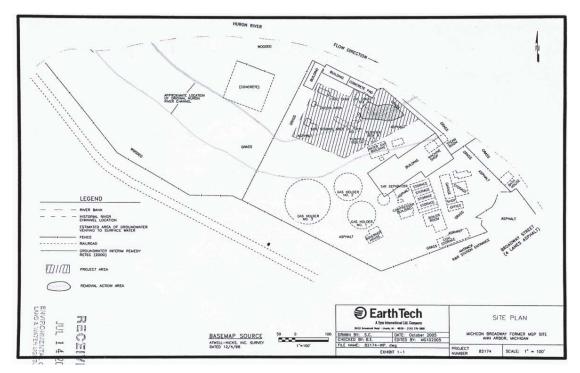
Site Plan for Contaminated Soil Removal in 2006-2007.
